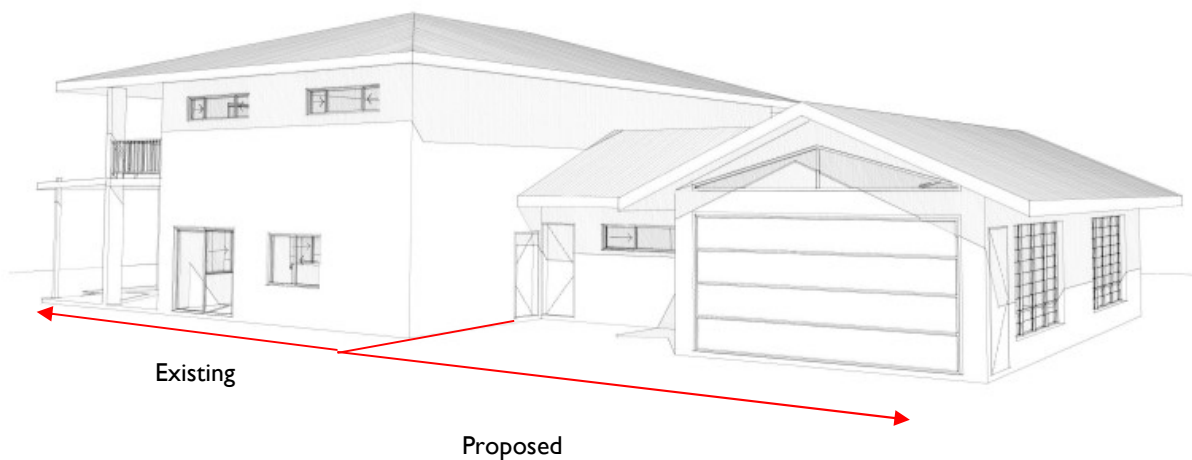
Proposal Plan Extract (source: Danny Vos Architect)
